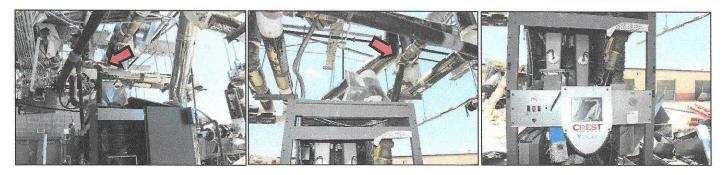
Natural gas lines extending from the supply to each boiler. In-line ball valves were in an open position.
